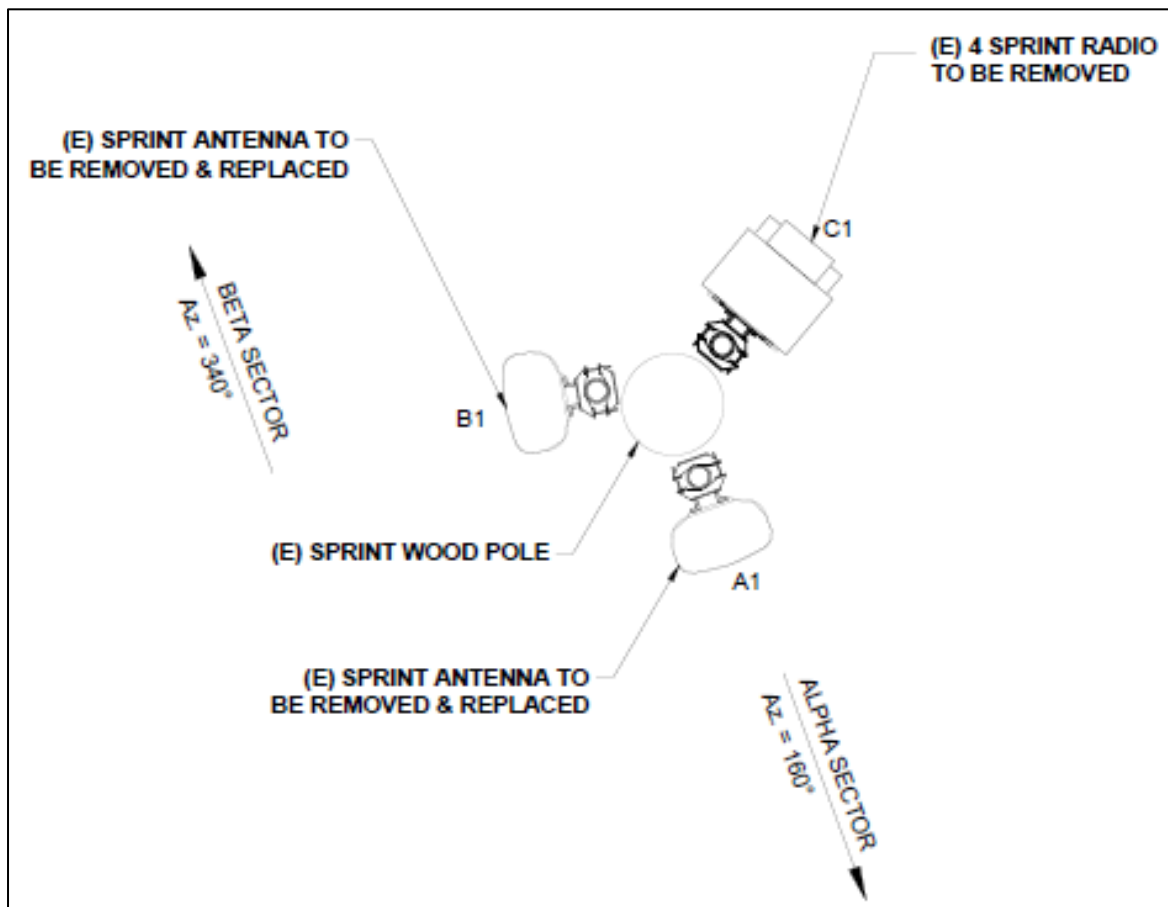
Existing antenna layout on the Monopole (Source: Plans, page A-3, panel 2).
